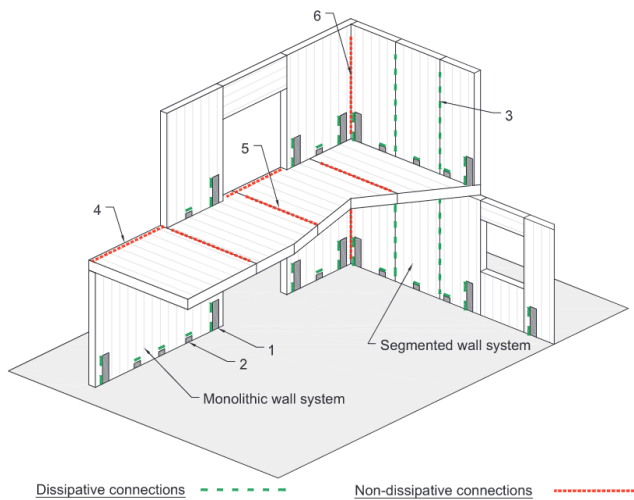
Schematic of a CLT structure (platform system) with an indication of the dissipative and non-dissipative connections (taken from Izzi et al., 2018)
